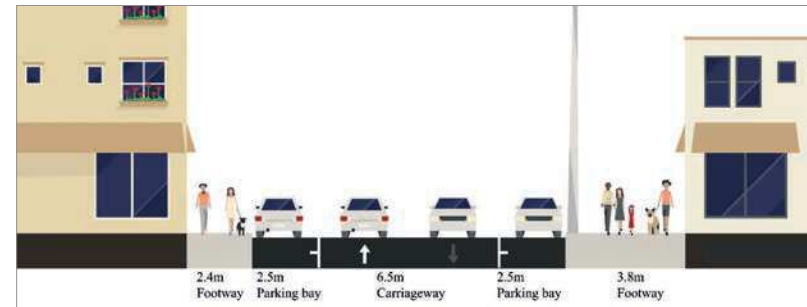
High Street Existing (with side street parking) (© Street Mix)
